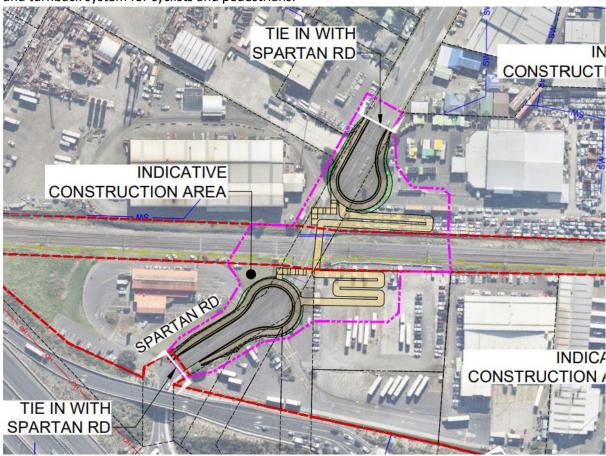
Spartan Road project area (source: NoR TLC General Arrangement Plan)
